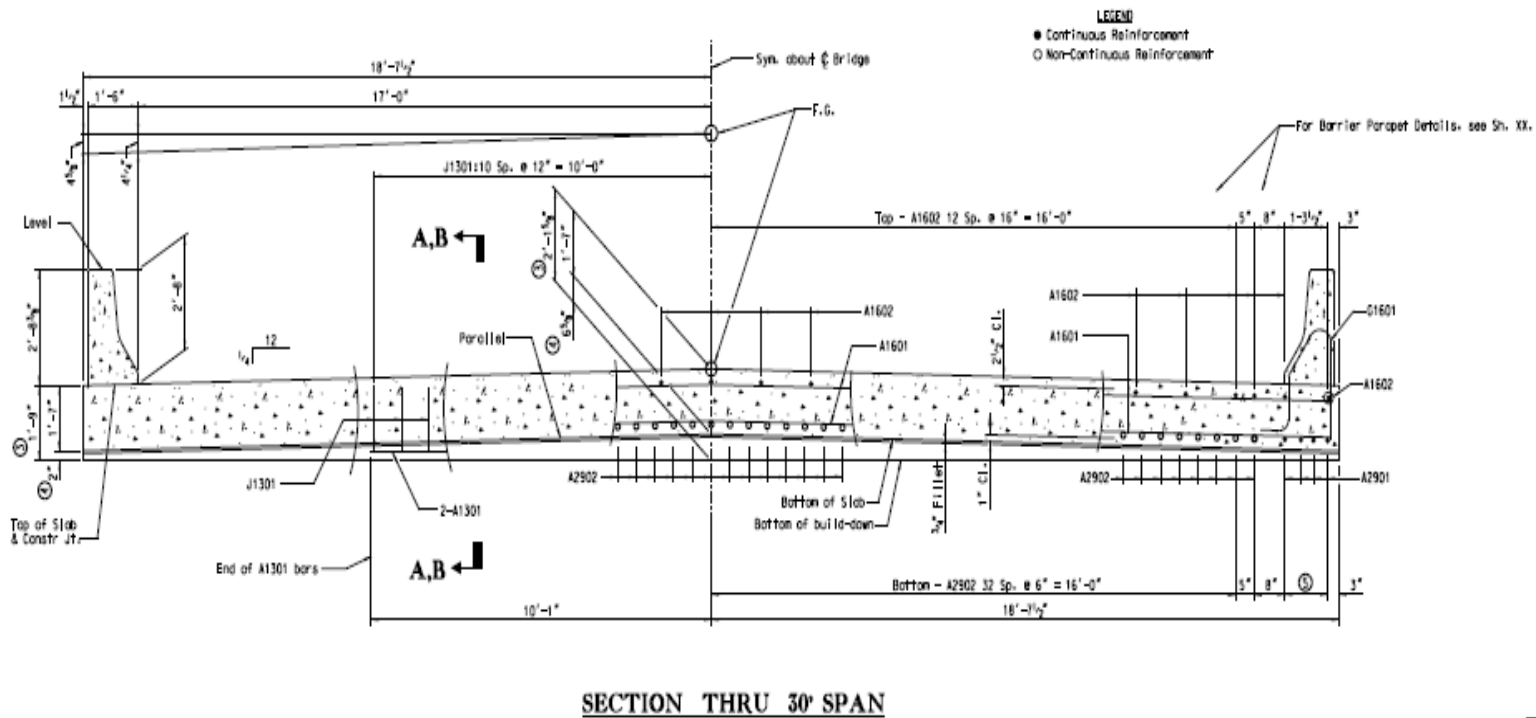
Cross-Sectional View of Archetype 1 Bridge (SCDOT 2011)
